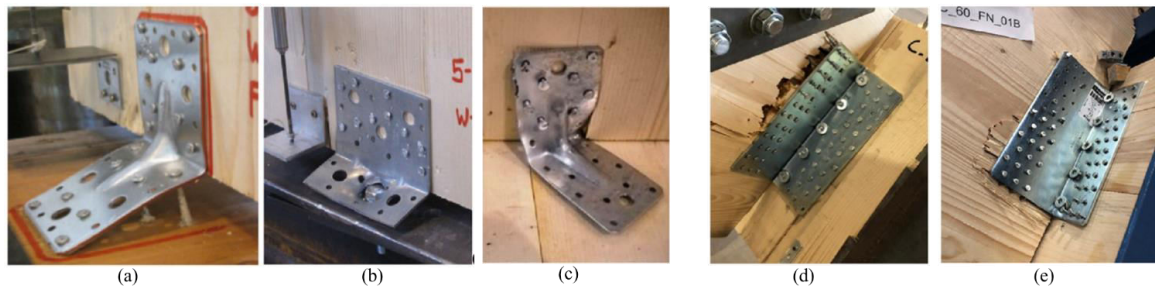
Connection failure modes: (a) fasteners withdrawal, (b) fasteners head pull-through, (c) metal bracket buckling, (d & e) timber panel brittle failure (tearing).
